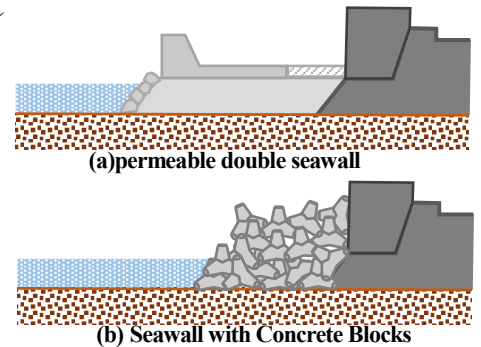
Explanatory sketch on permeable double seawall and Seawall with Concrete Blocks
